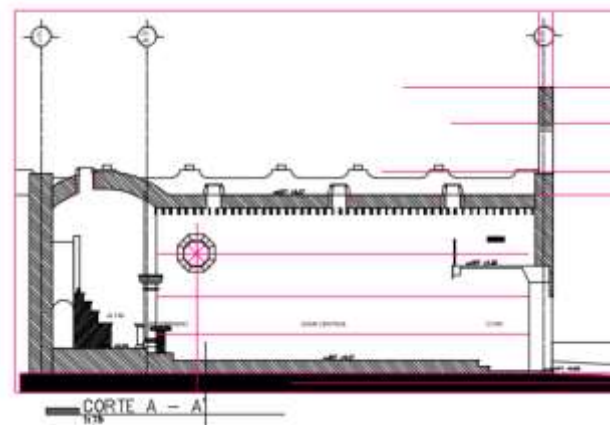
Typical schematic section of a religious building as part of the technical data sheet focusing on construction systems and materials used in religious buildings
